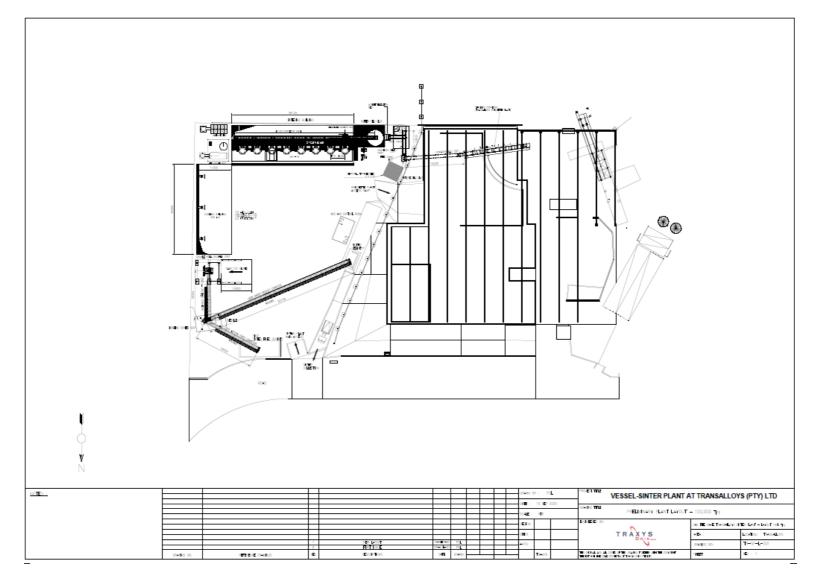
Layout 2 – alternative layout on alternative location (Traxys, 2020)
